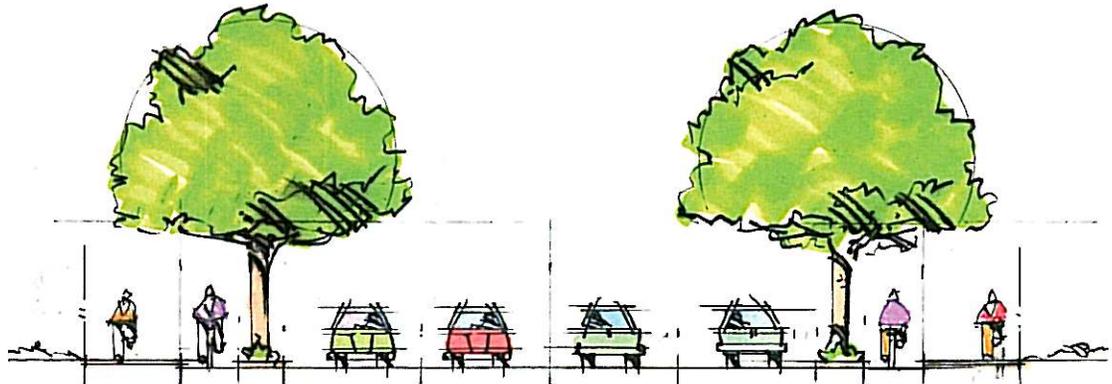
Alternative A – One-way bike lane with landscape separation on two sides. Maintains four vehicle travel lanes*. Provides one-way directional bike lane on each side of the street. Existing pedestrian walkways remain. Landscape planters separate the bicycles and pedestrians from vehicular traffic, provide shade, and reduce the scale of the street.
